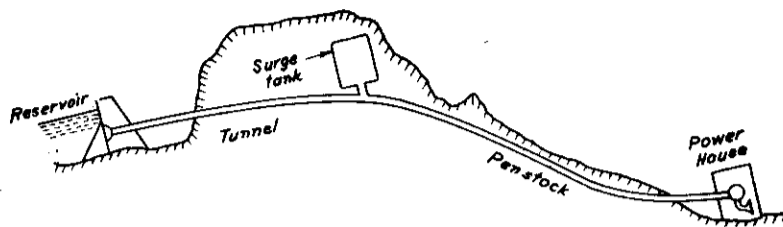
(c) Underground surge tank with penstock partly underground.
